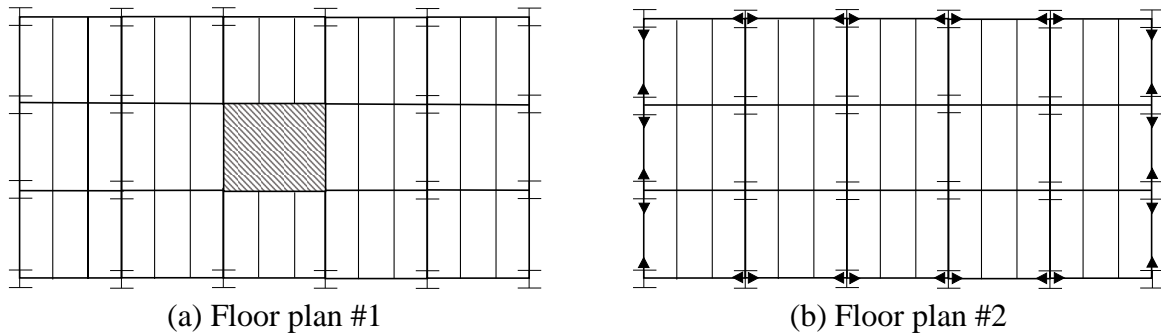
Floor plan of the steel-concrete composite buildings examined: (1) floor plan #1 with an interior rigid core; and (b) floor plan #2 with exterior moment resisting frames.
